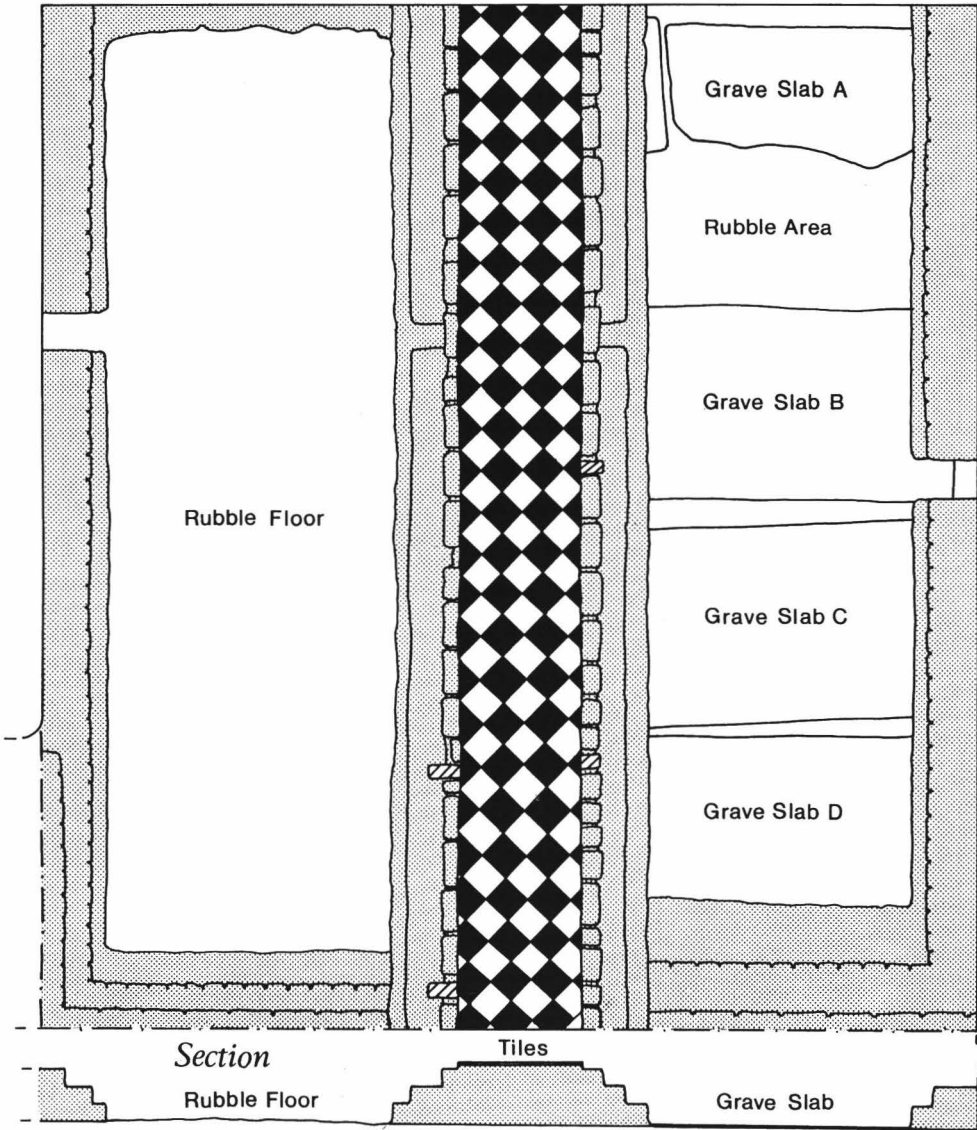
Plan of Lady Chapel, Rustington Parish Church.
